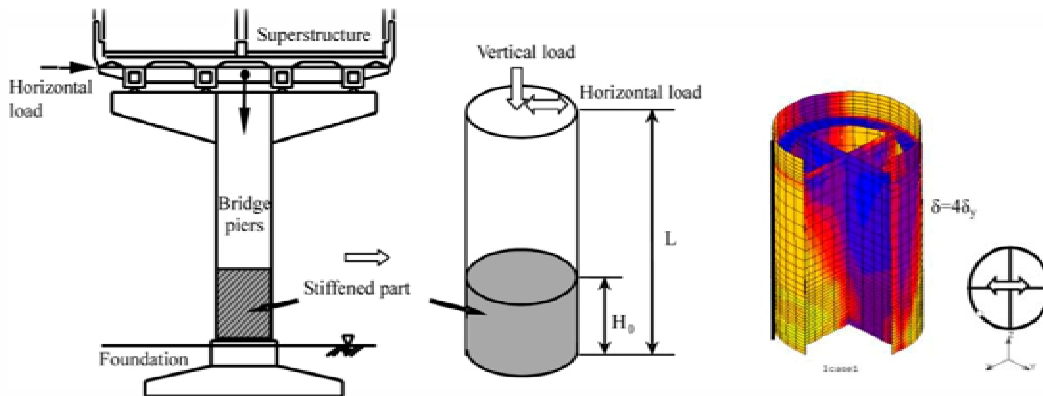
Circular cruciform sections in the base of bridge piers, with stiffening plates.
